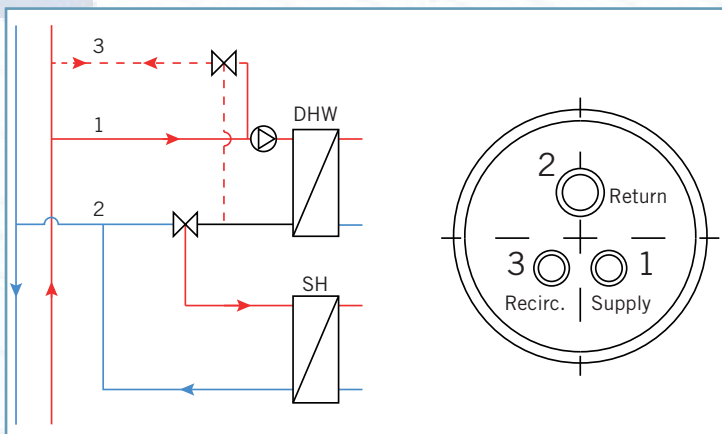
Minimum cooling concept with a triple service pipe (Dalla Rosa et al. 2011)
